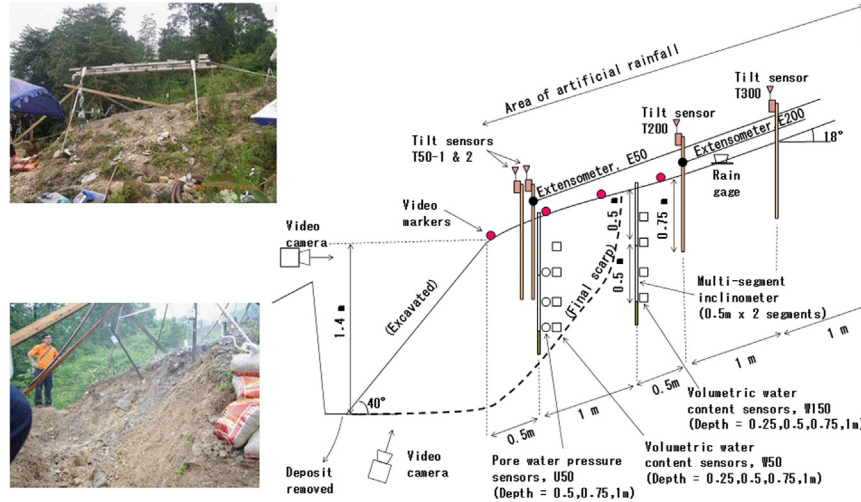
Vertical cross-section of slope site for artificial rainfall test, and its photos before and after failure.
